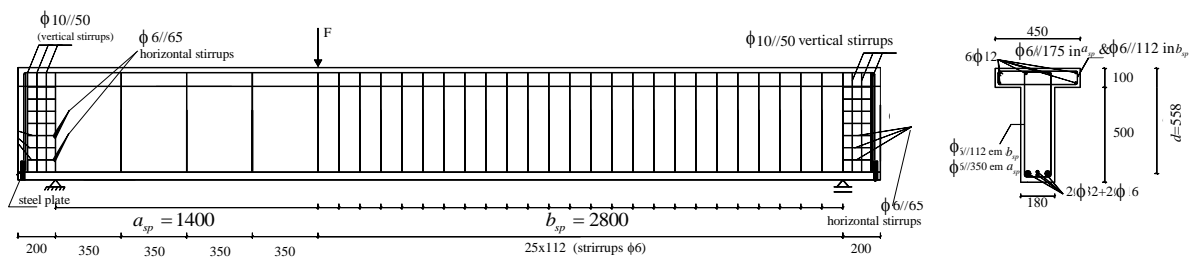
25 - Geometry of the reference beam (3S-R), steel reinforcements common to all beams, support and load conditions (dimensions in mm) (Barros and Dias, 2013).
